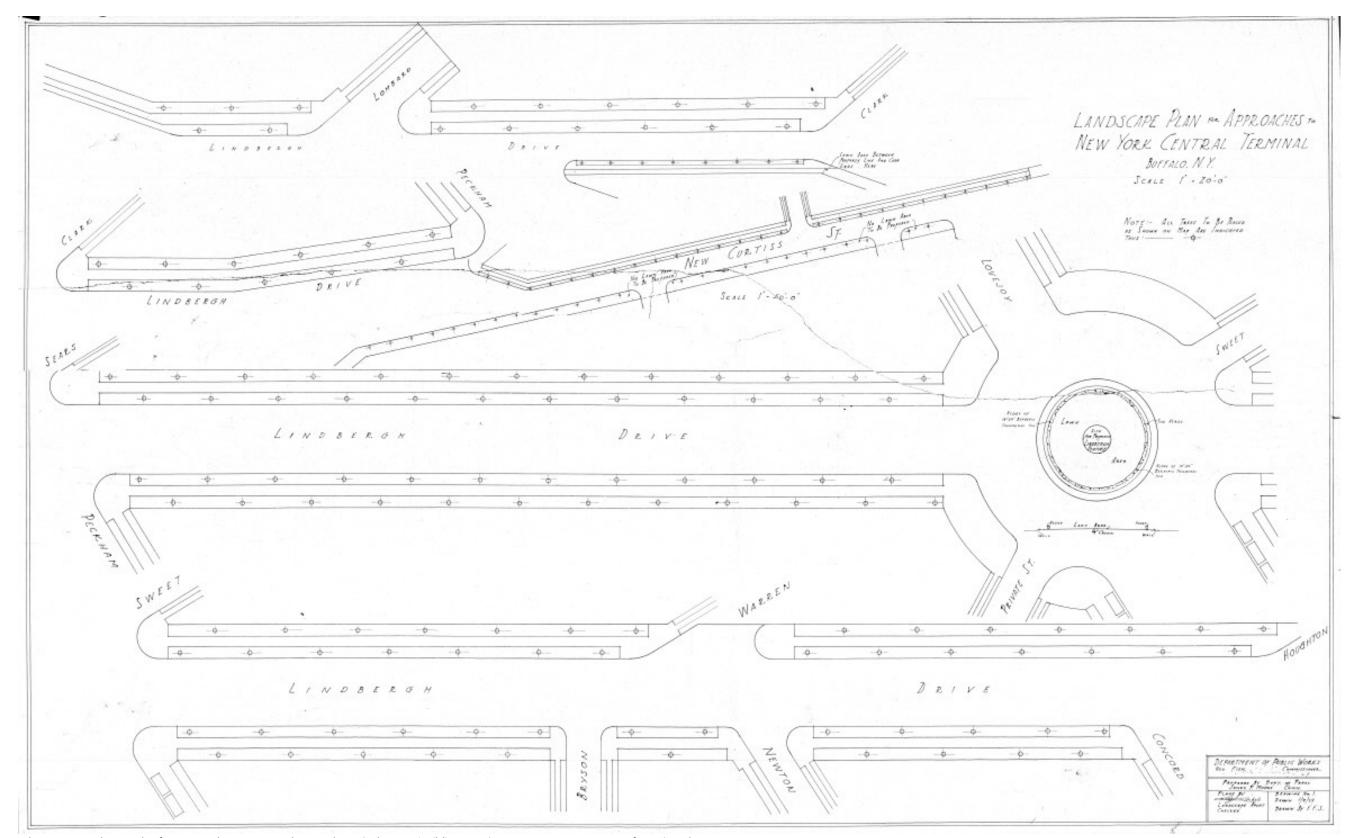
"Landscape Plan for Approaches to New York Central Terminal," 1929. (Building Permit Department, Department of Permit and Inspection Services, City of Buffalo)
